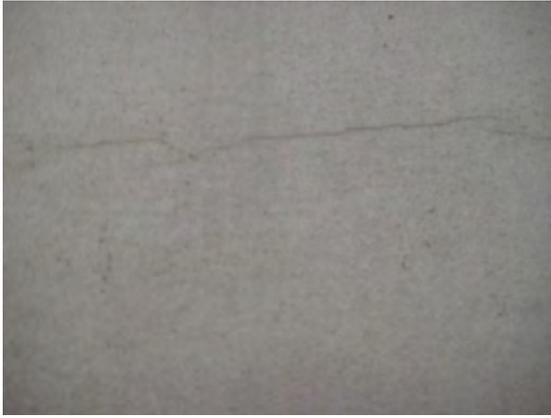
(9): Horiz. Cracking in T-C Panel
